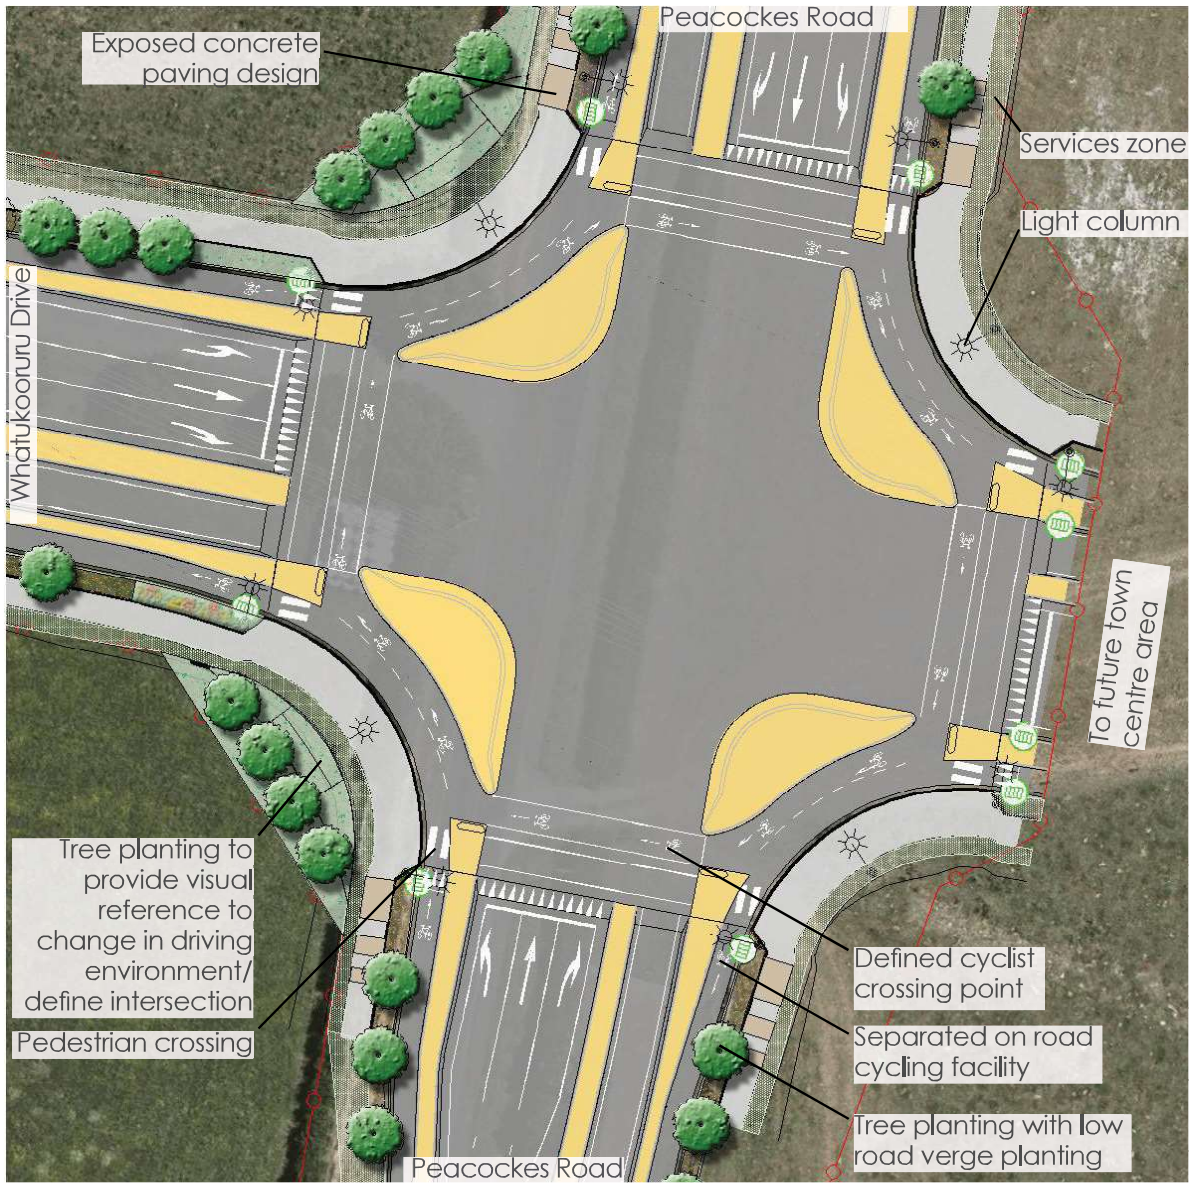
ILLUSTRATION OF WHATUKOORURU DRIVE AND PEACOCKES ROAD INTERSECTION
